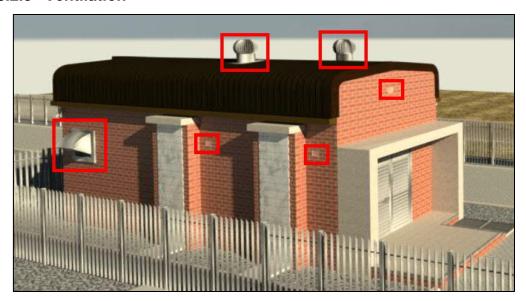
Exterior view showing airbricks, wall mounted extractor fan and roof ventilators.
